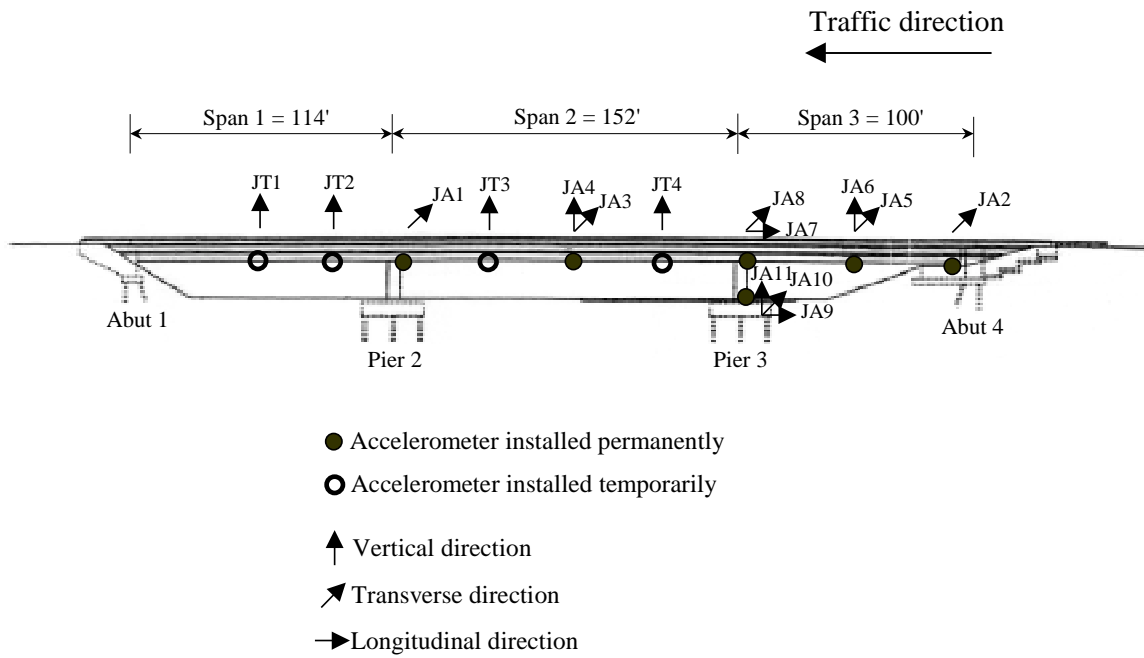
Accelerometer Arrangement at Jamboree Road Overcrossing; Elevation
